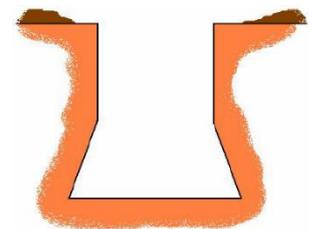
Figure D: Bellbottom pier whole trench (HMTRI, 2000).
